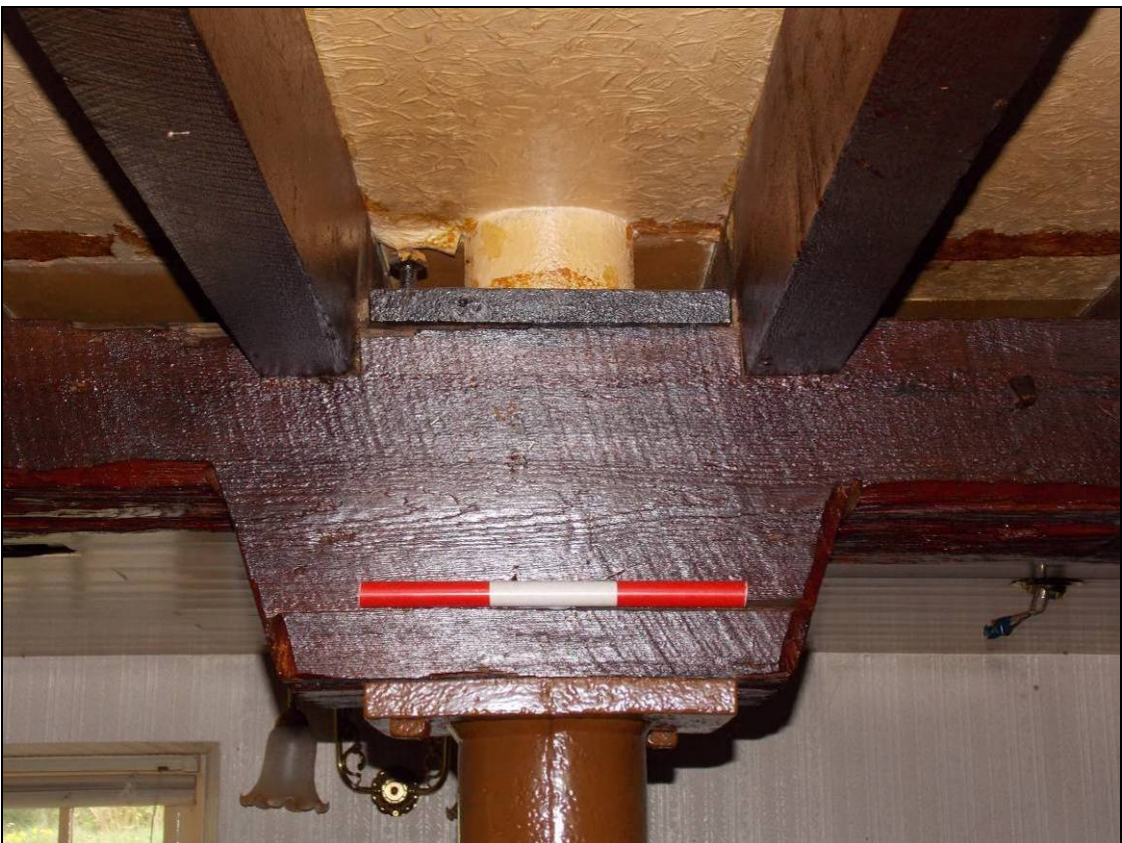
Detail of column's capital and truncated beam, looking west (scale 300mm).
